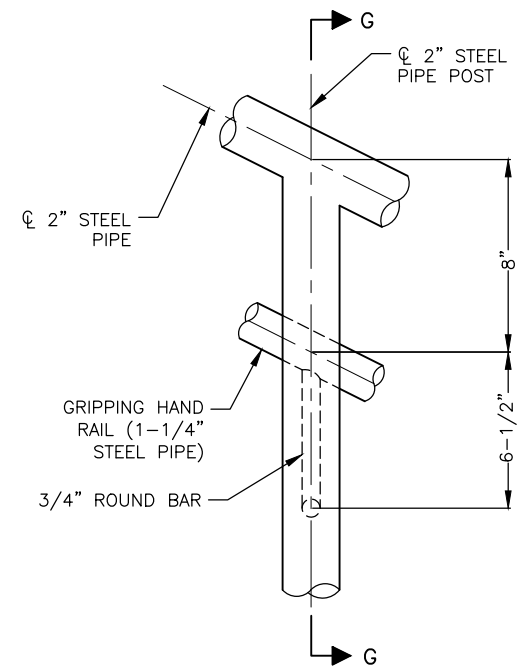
HAND GRIP TERMINATION, TOP VIEW
